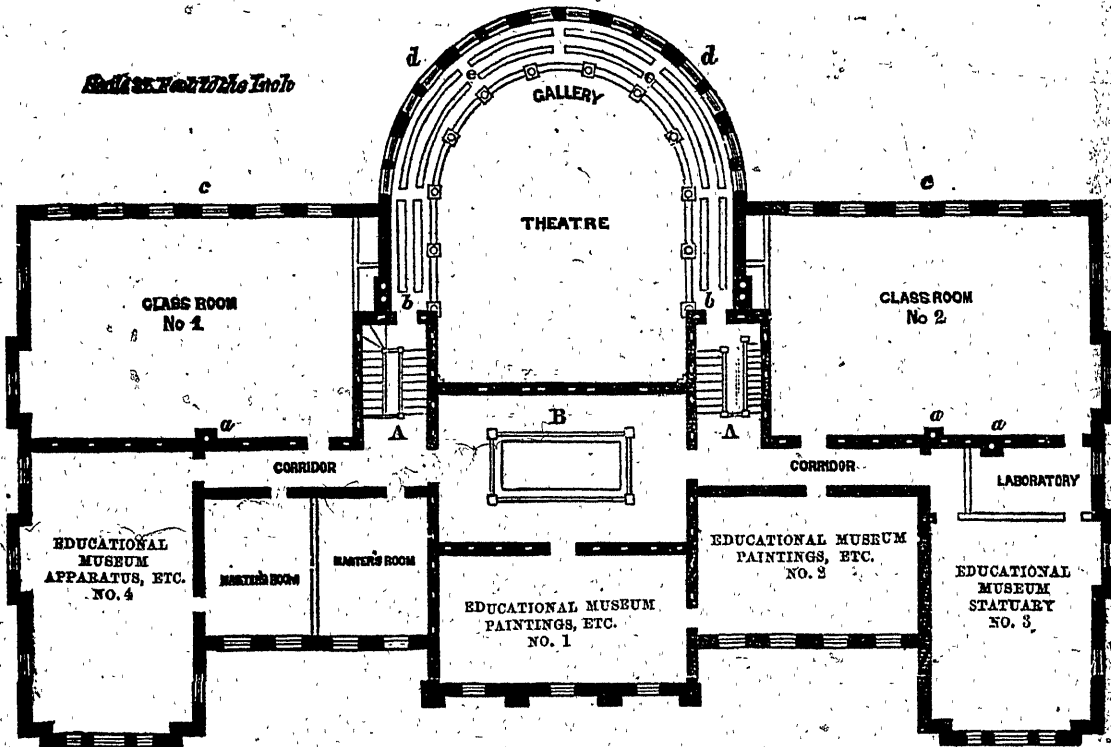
UPPER FLOOR NORMAL SCHOOL BUILDINGS.
